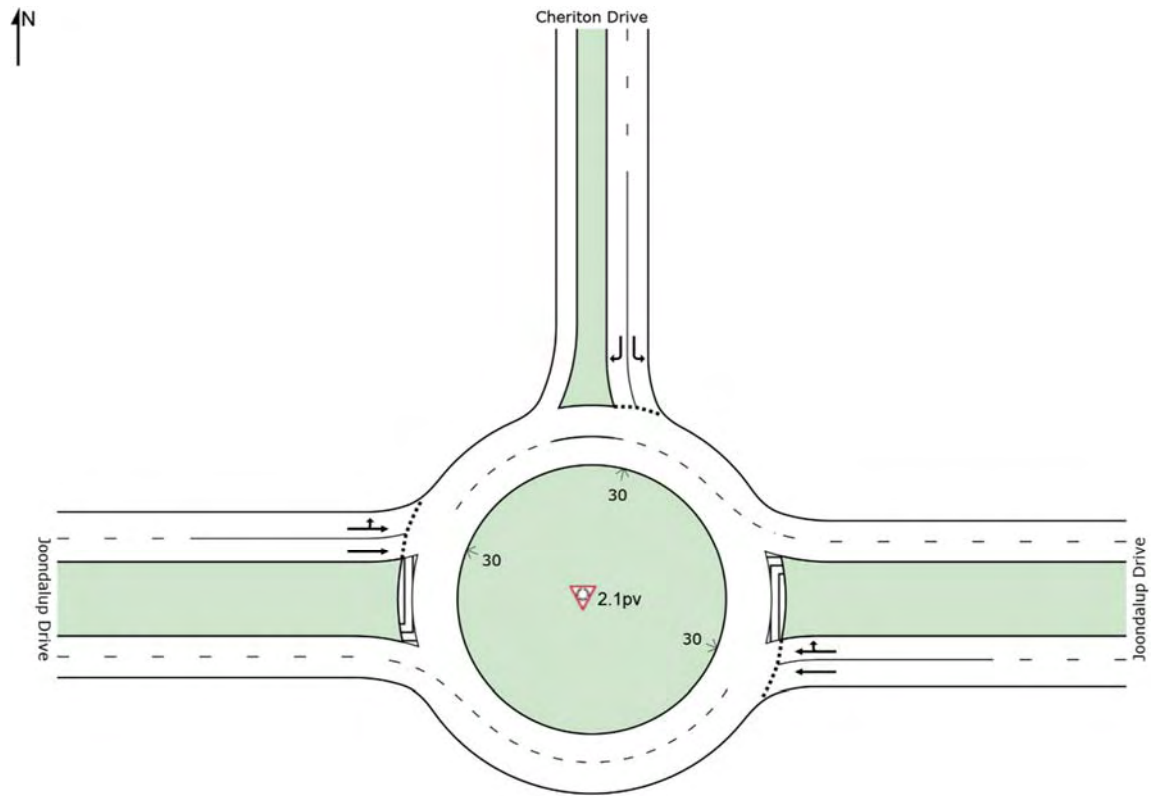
Proposed Roundabout of Joondalup Drive and Cheriton Drive – SIDRA Schematic Geometry
